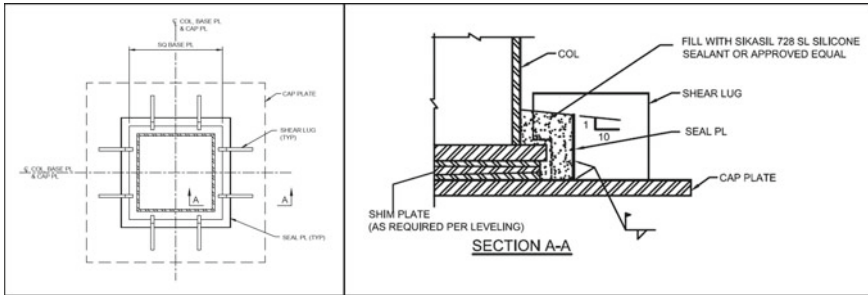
Shear lug detail and connection with embed or steel cap plate
